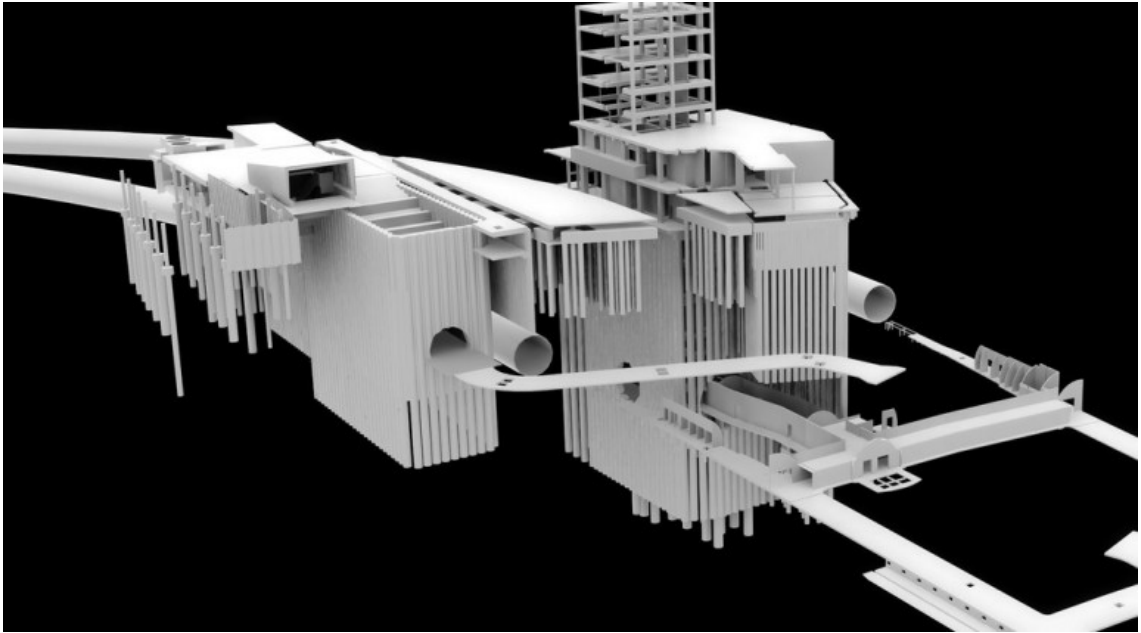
3D BIM visualisation of Liverpool Street Station (<http://www.crossrail.co.uk/construction/building-information-modelling/>).
